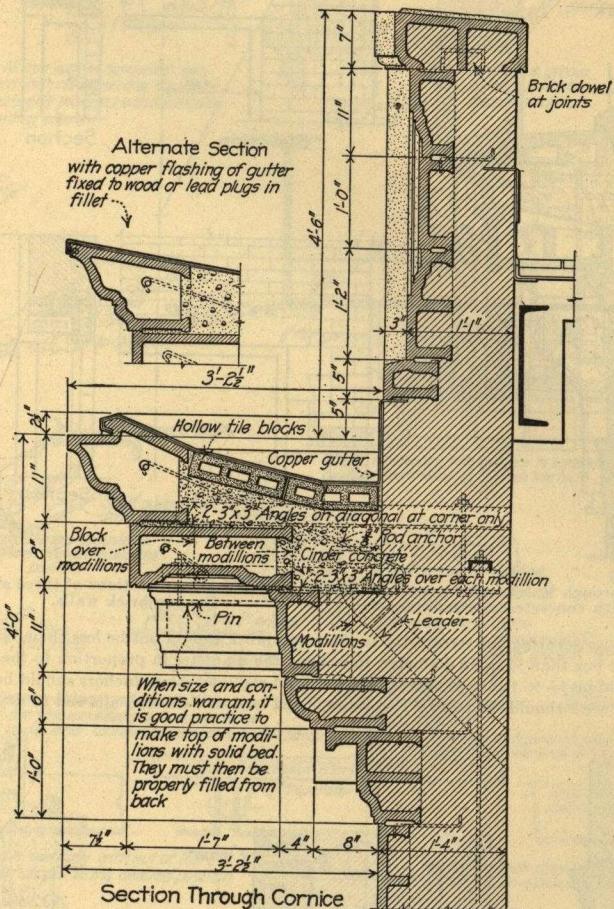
Modillion cornice with gutter showing method of support and anchorage, construction of gutter, etc.
